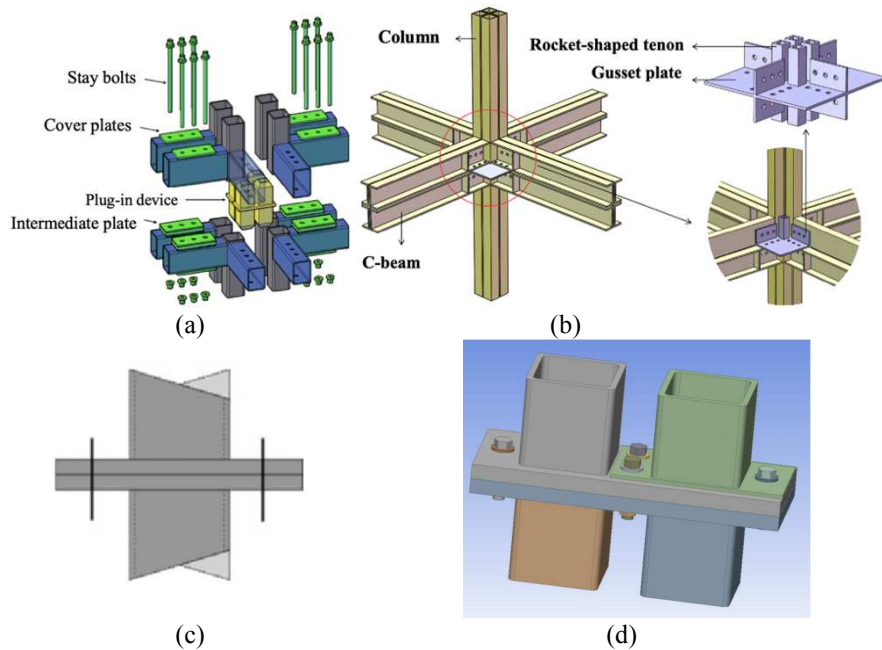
Examples of existing inter-module connections [10] (a) bolted connection with plug-in device [9] (b) bolted connection with rocket-shaped tenon and gusset plate [11] (c) bolted end plate [12] (d) bolted beam-to-beam module connection [13].
